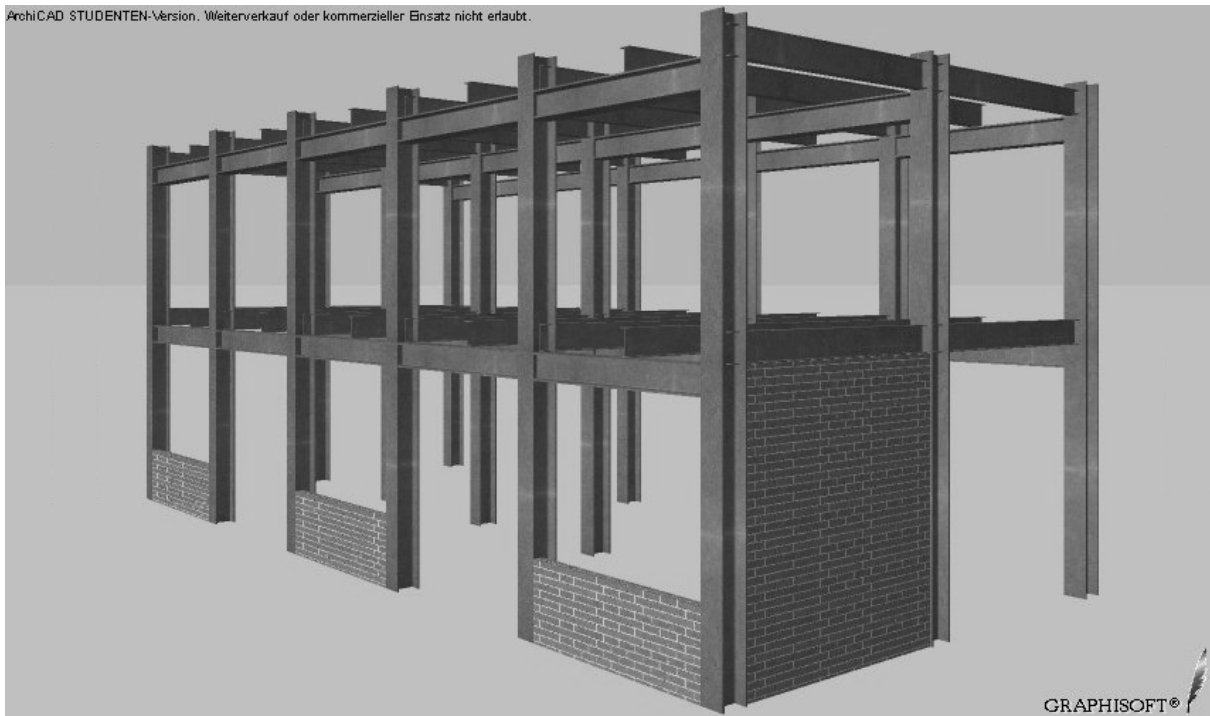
Key seismic features: infill walls (an archive photo showing infilling of metal frame on the building site is found in the Nägele, 1992, on page 104)
